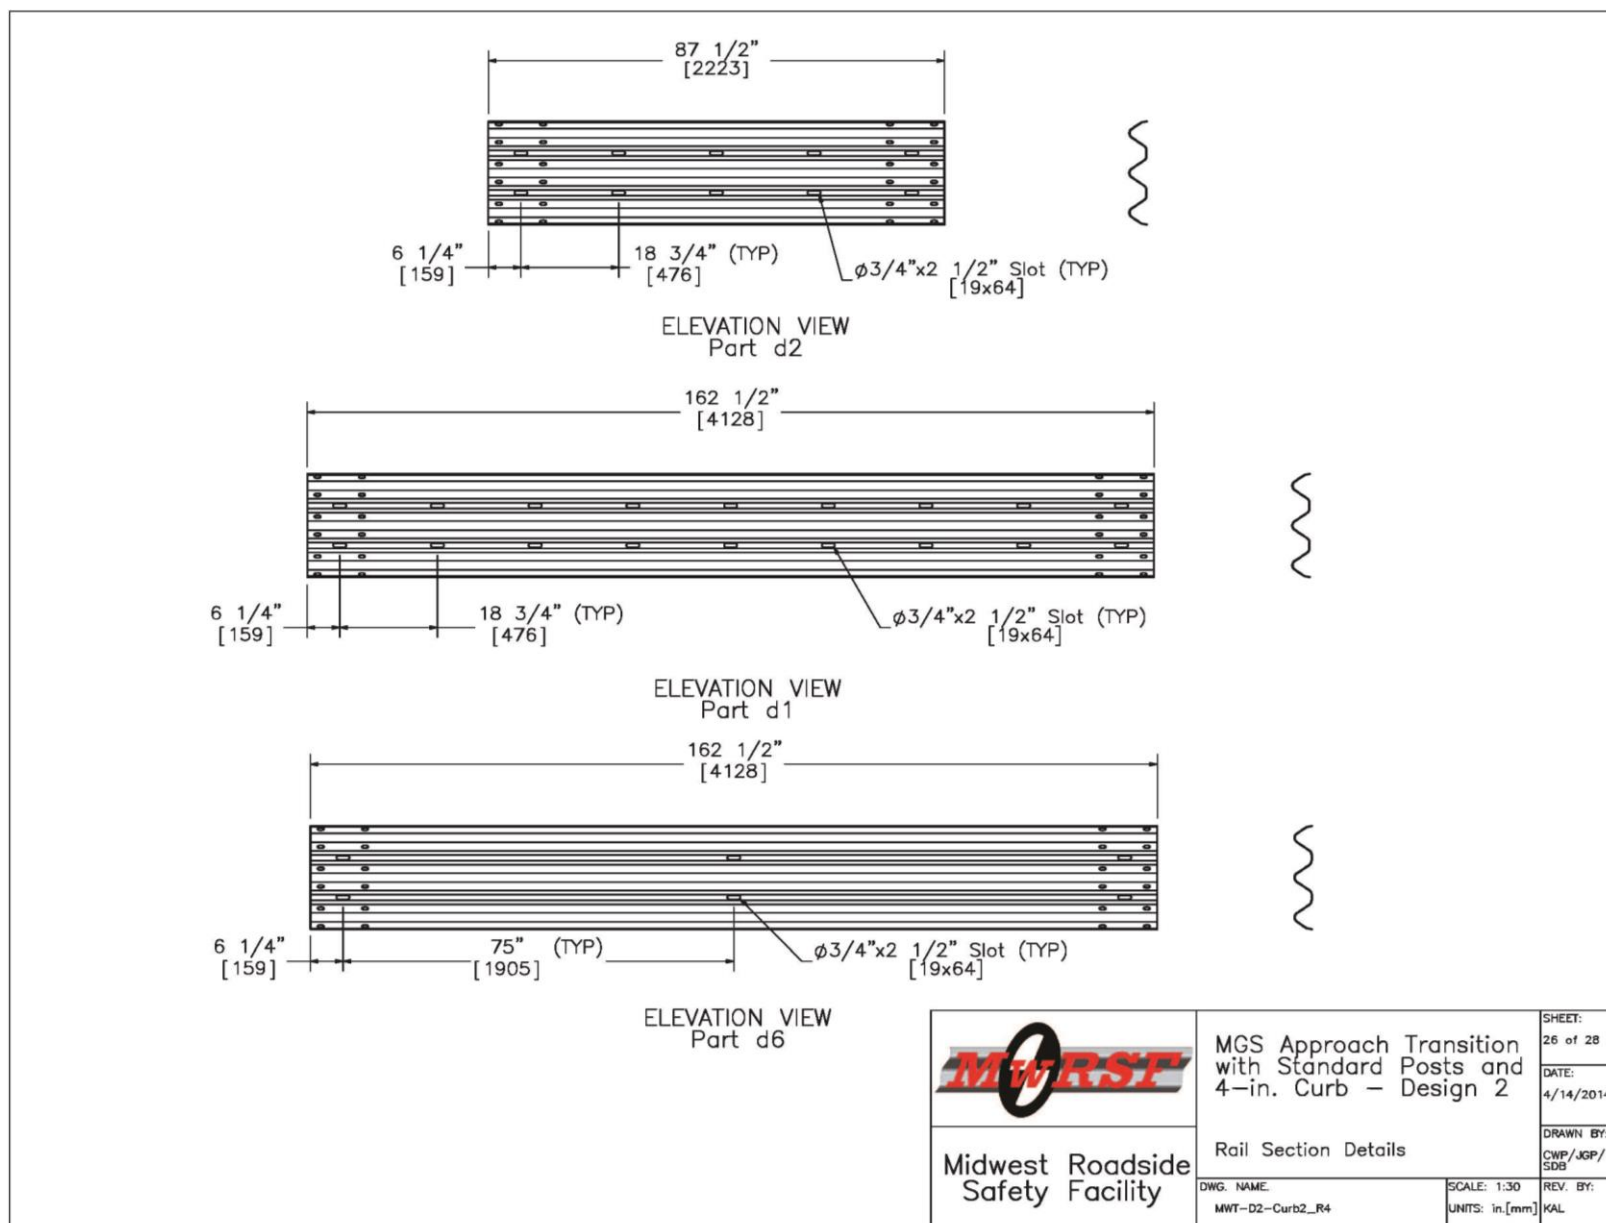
Rail Section Details, Test Nos. MWTC-2 and MWTC-3
